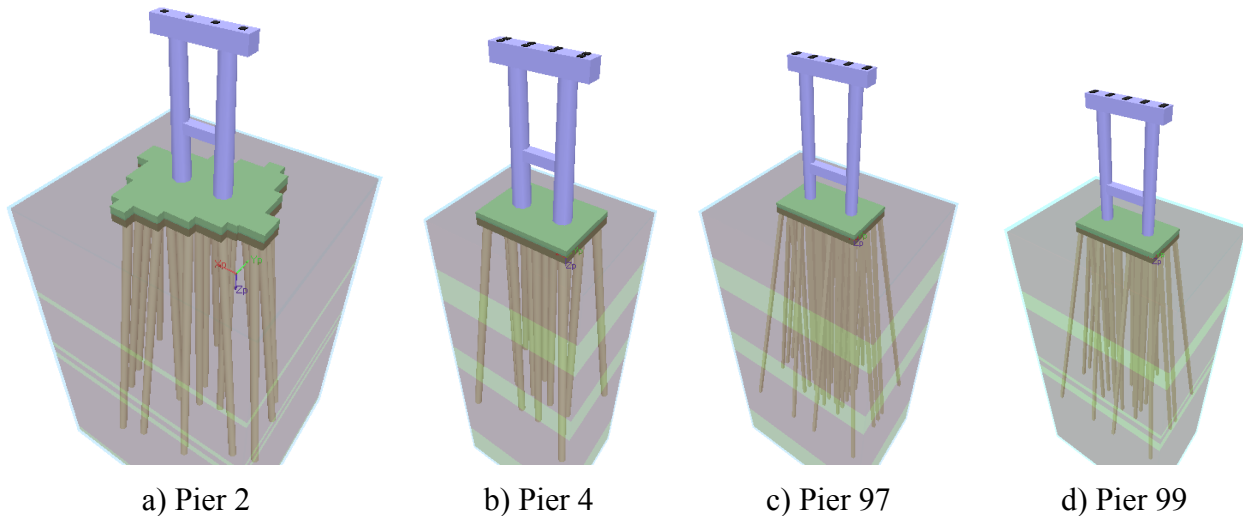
FB-MultiPier models of selected piers from LA-1 Bridge
